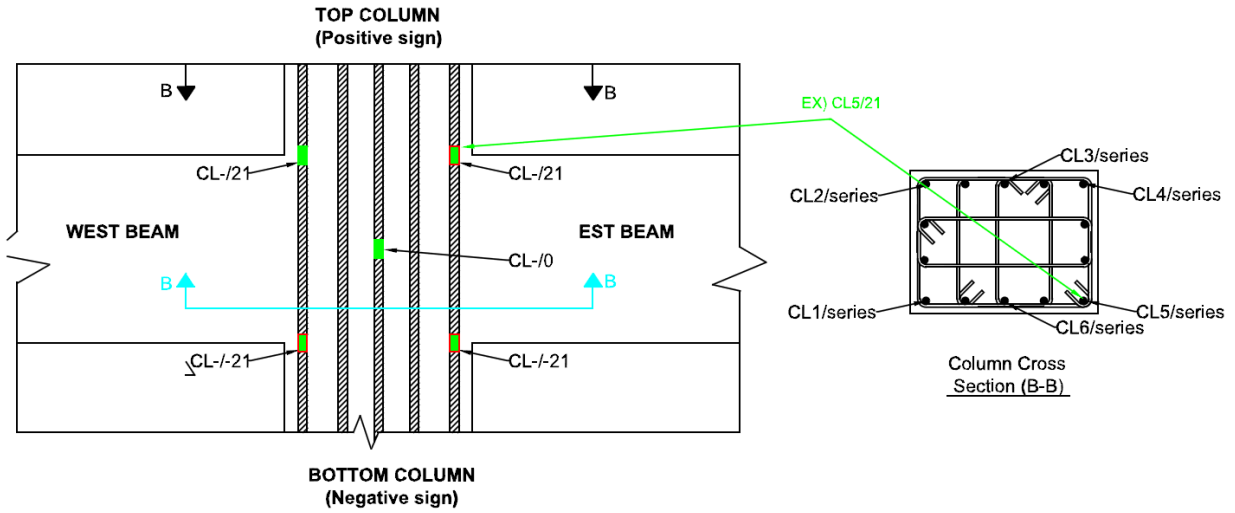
Locations of strain gauges on column longitudinal reinforcement
